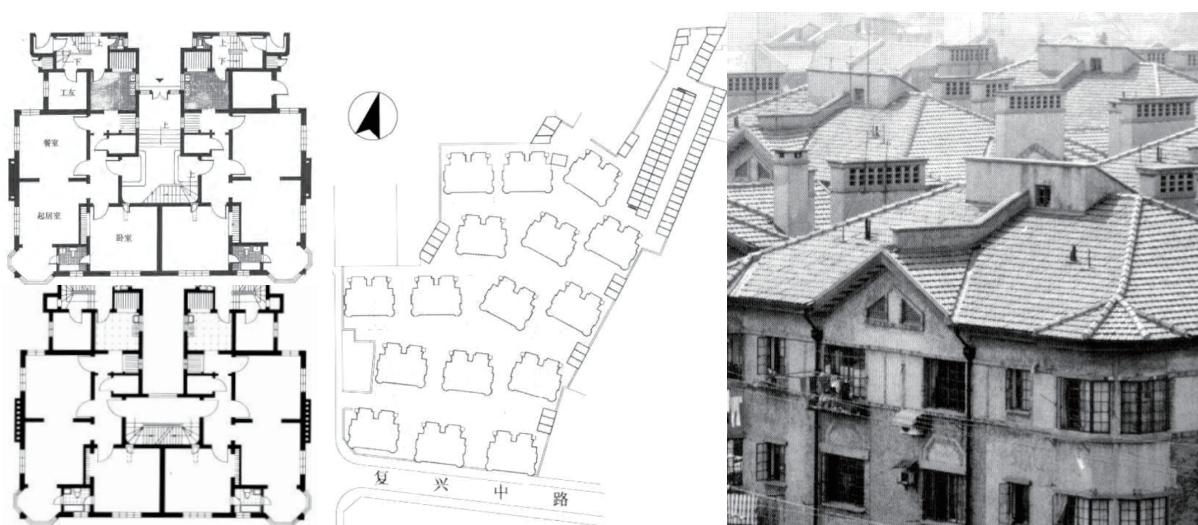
Shanghai Shannan village, a house estate consisting of multi-story apartment building
